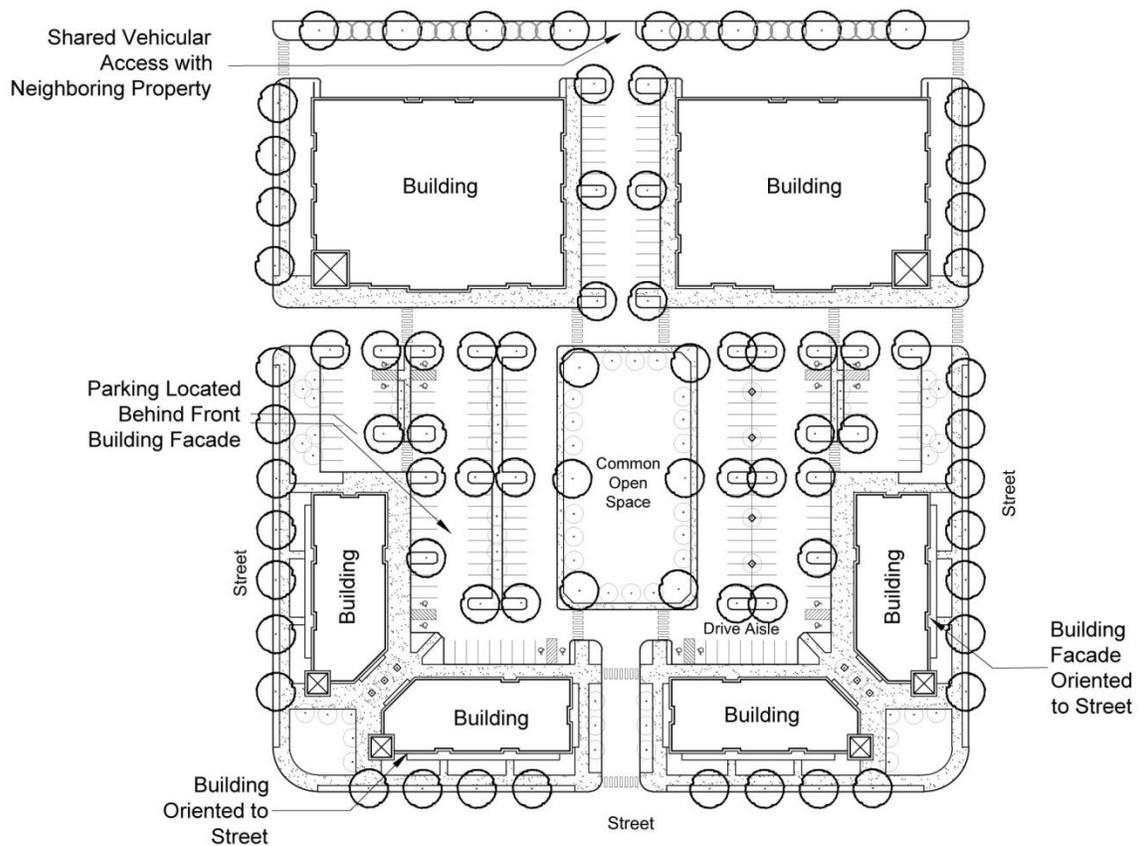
(c). – Site Layout – Parking Design Standards
